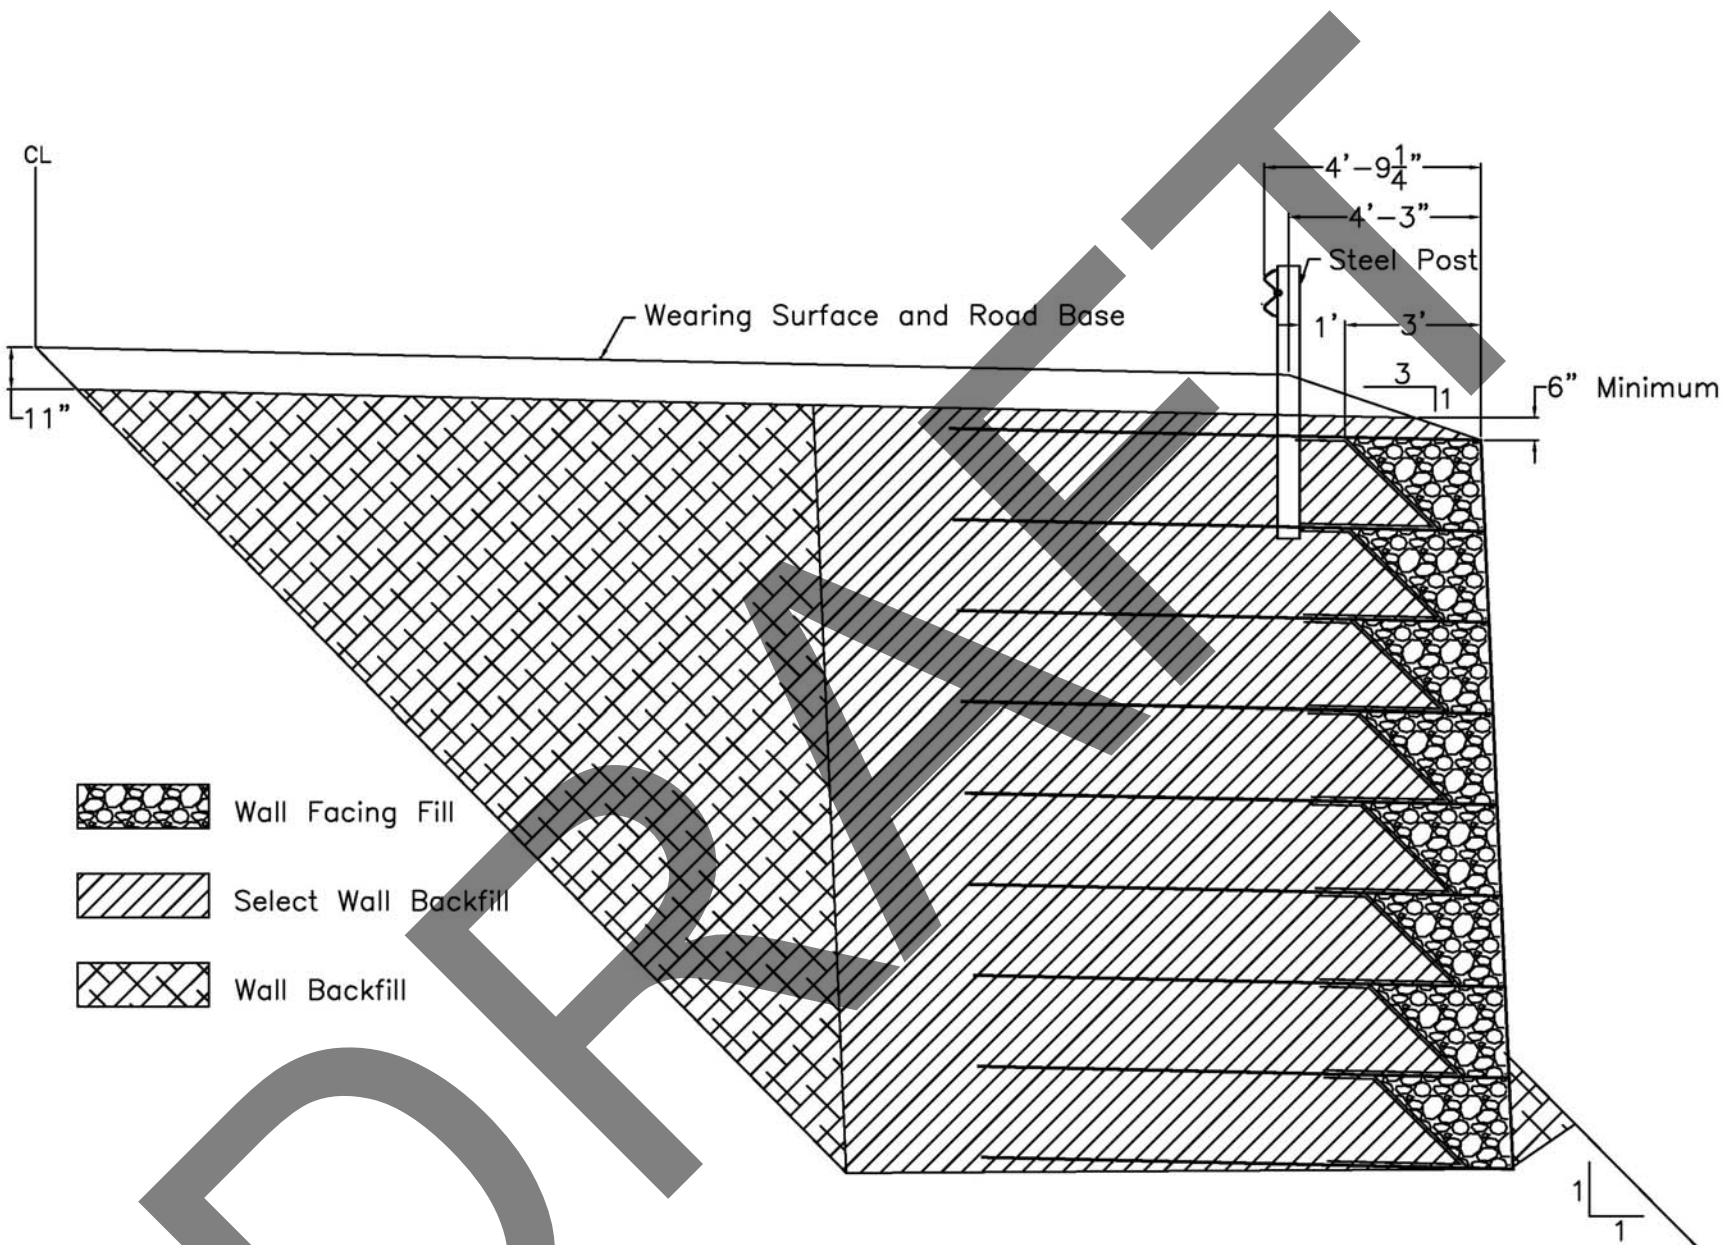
Schematic. Non-Blocked, Steel-Post MGS Centered at Slope Break Point with Minimum Lateral Offset.
